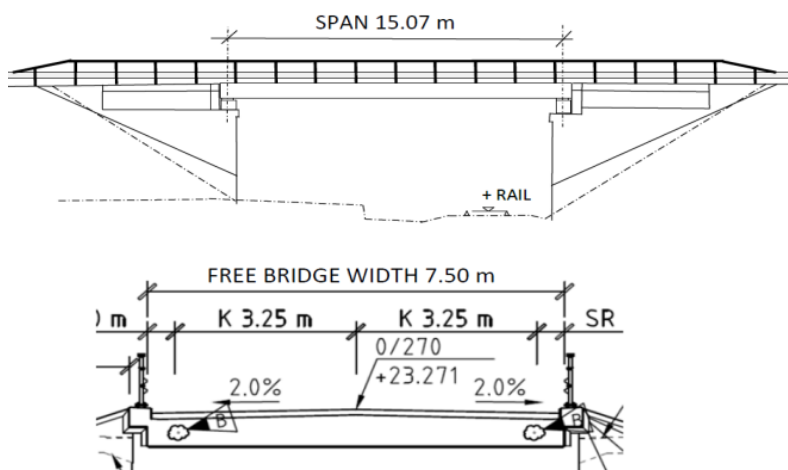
Details of the concrete bridge; elevation (above) and section (below)
